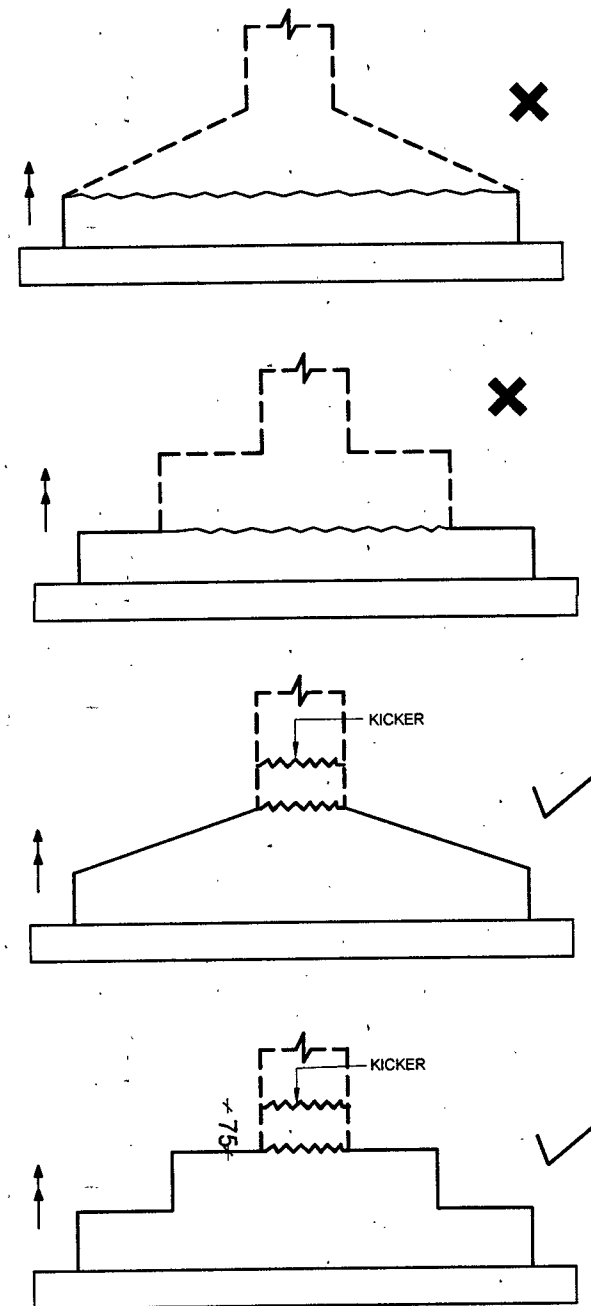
CONSTRUCTION JOINTS IN FOOTING
